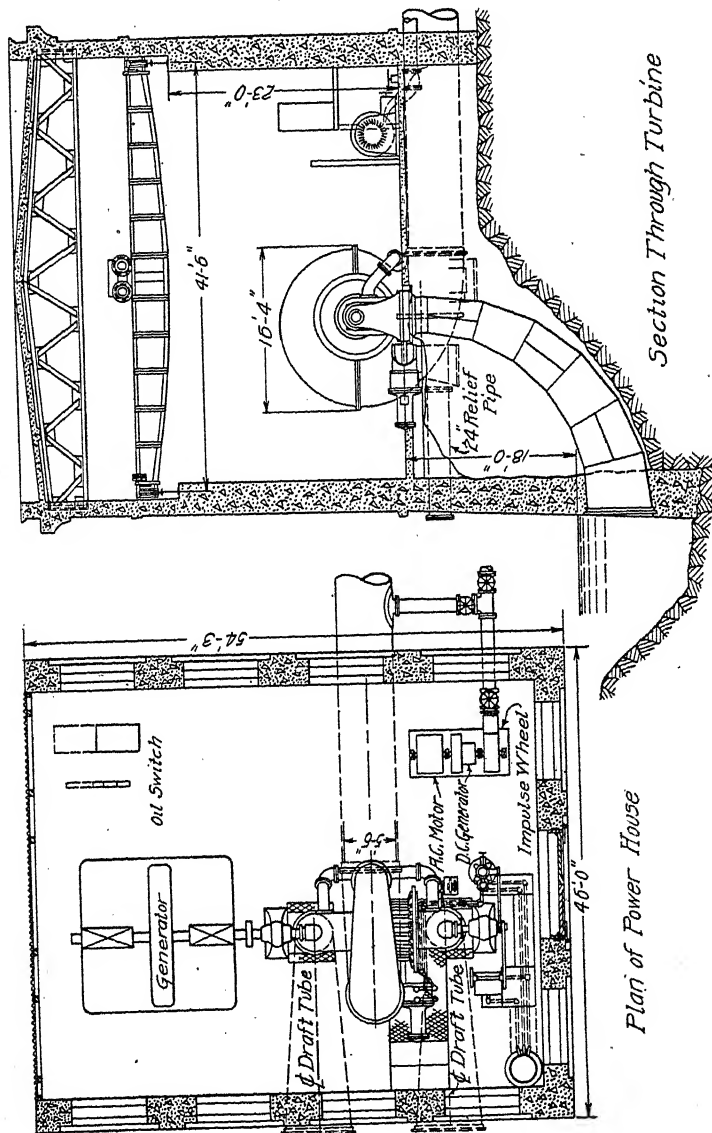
Plan and Section of Equipment in New Power House of Snoqualmie Power Company, Washington
